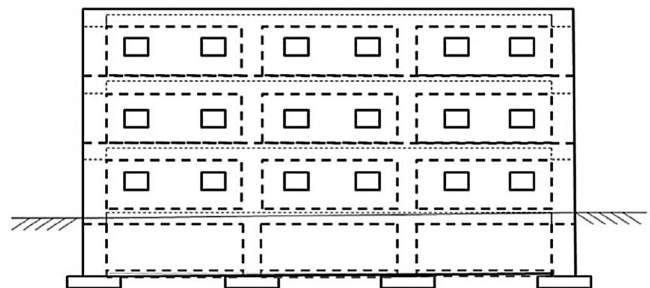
Base at foundation level where there are full-length exterior shear walls.
